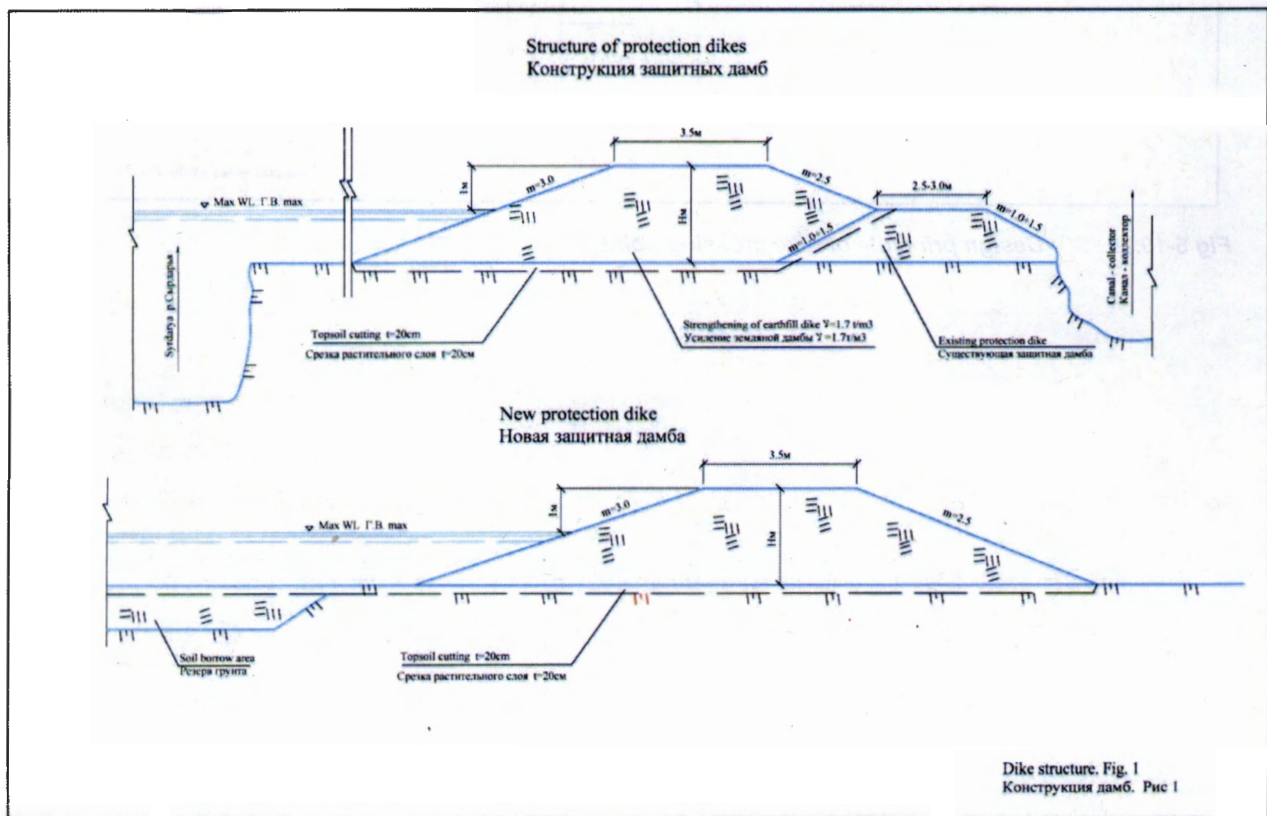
Design principle of the strengthening of the existing dikes and new dikes .
